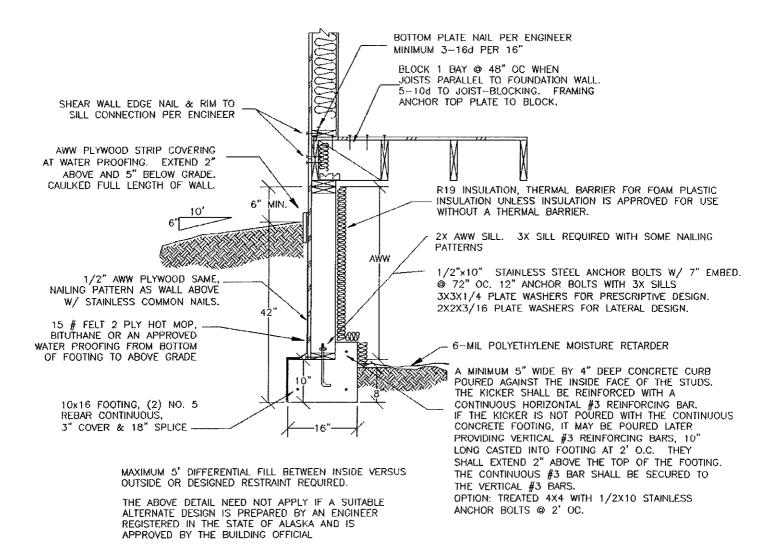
R403-37 Typical Basement Foundation Wall.
